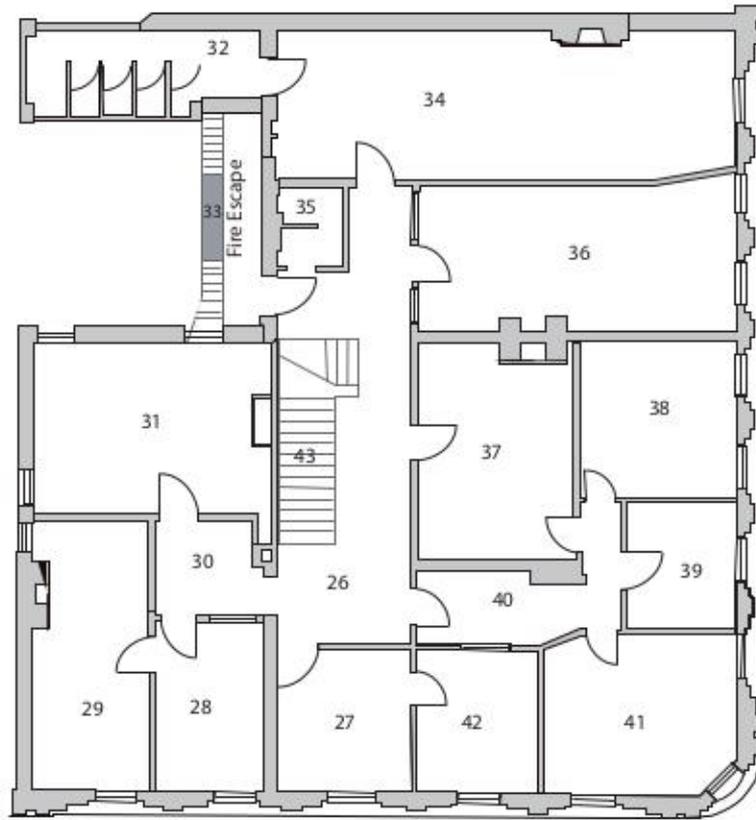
Ground floor plan of 73-81 Dee Street, from onsite observations 29 May 2017 (base plan taken from plan in Figure 5-36)
